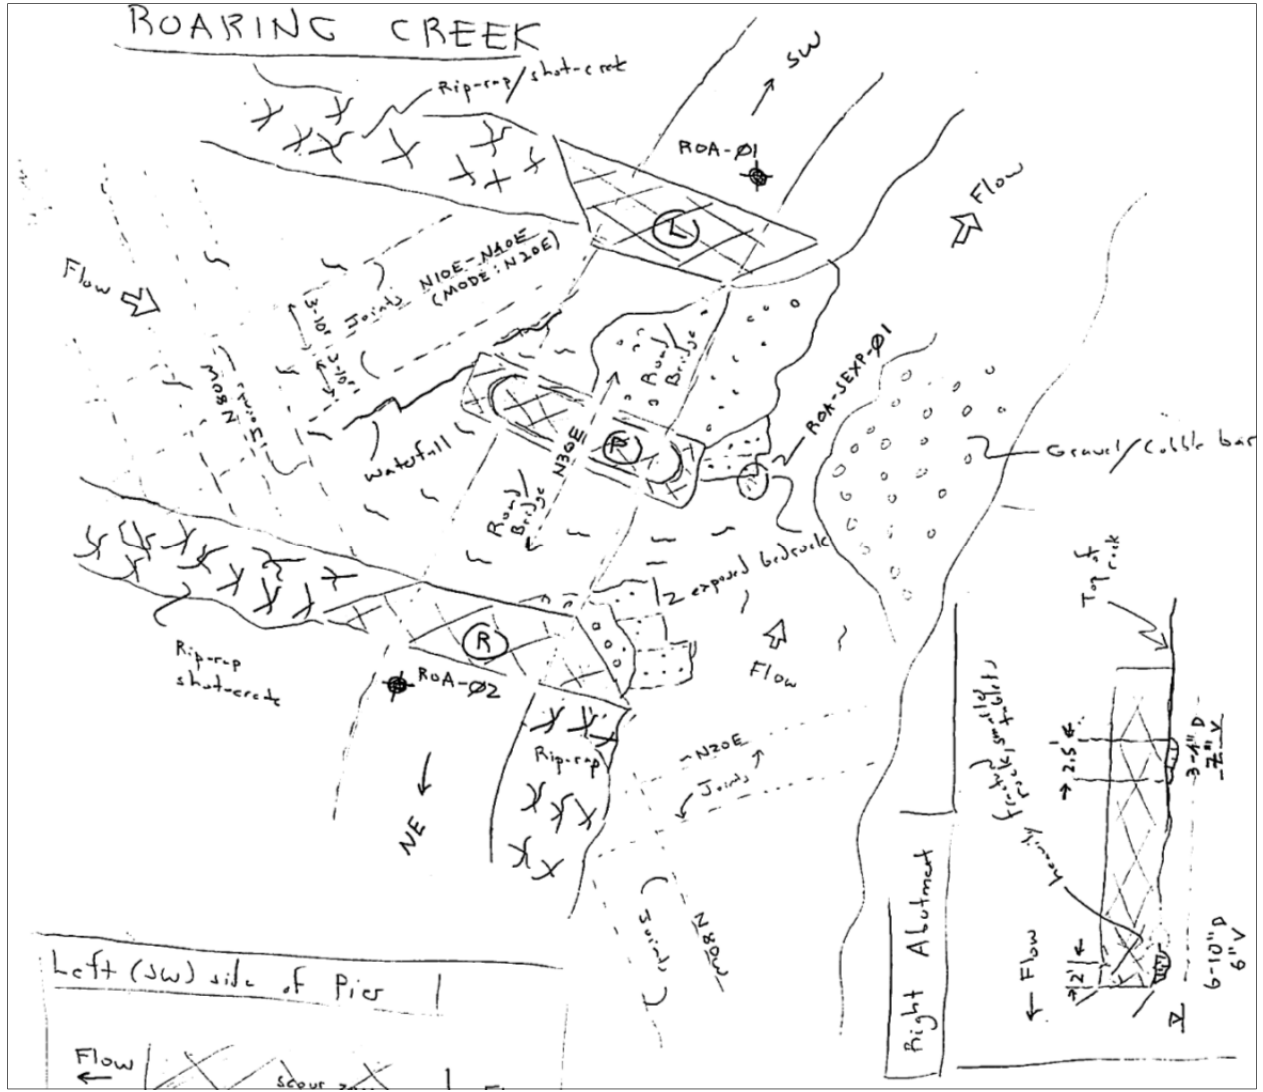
Field sketch of Roaring Creek Bridge, overhead view and right abutment (lower right).
